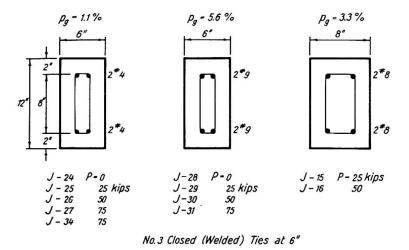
Cross Section of Beam-Columns (with Axial Load)
